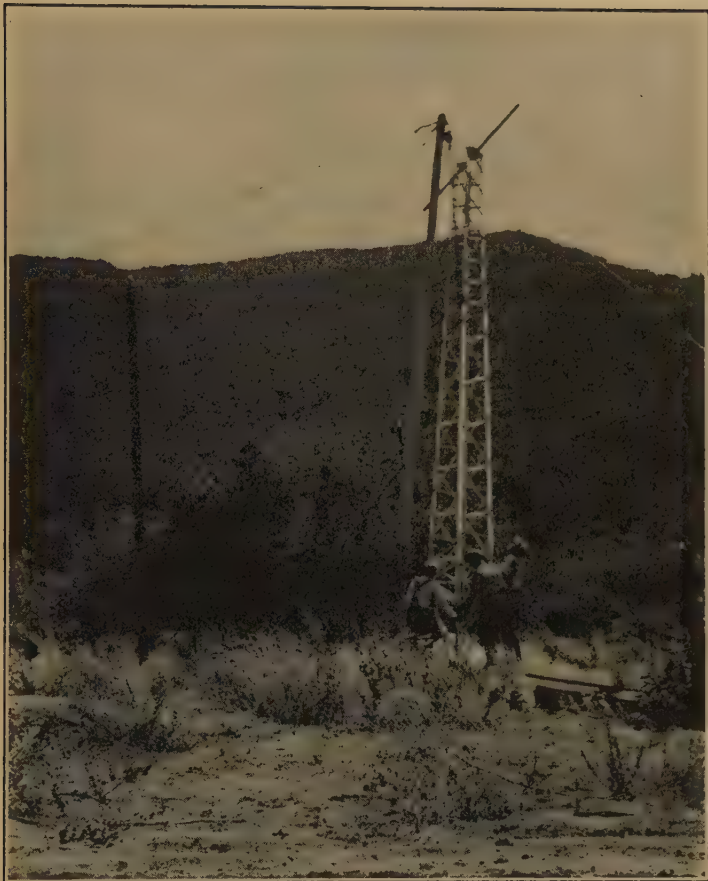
HOISTING A LATTICE STEEL POLE INTO PLACE BY USE OF
